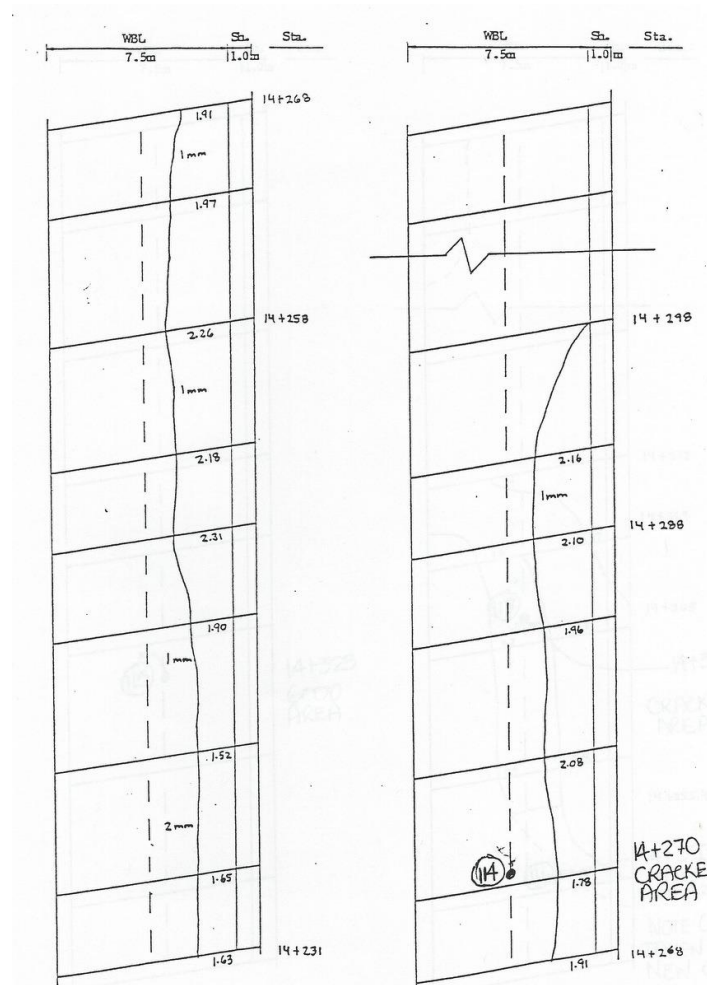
Illustration of longitudinal cracking on a section of the highway.
